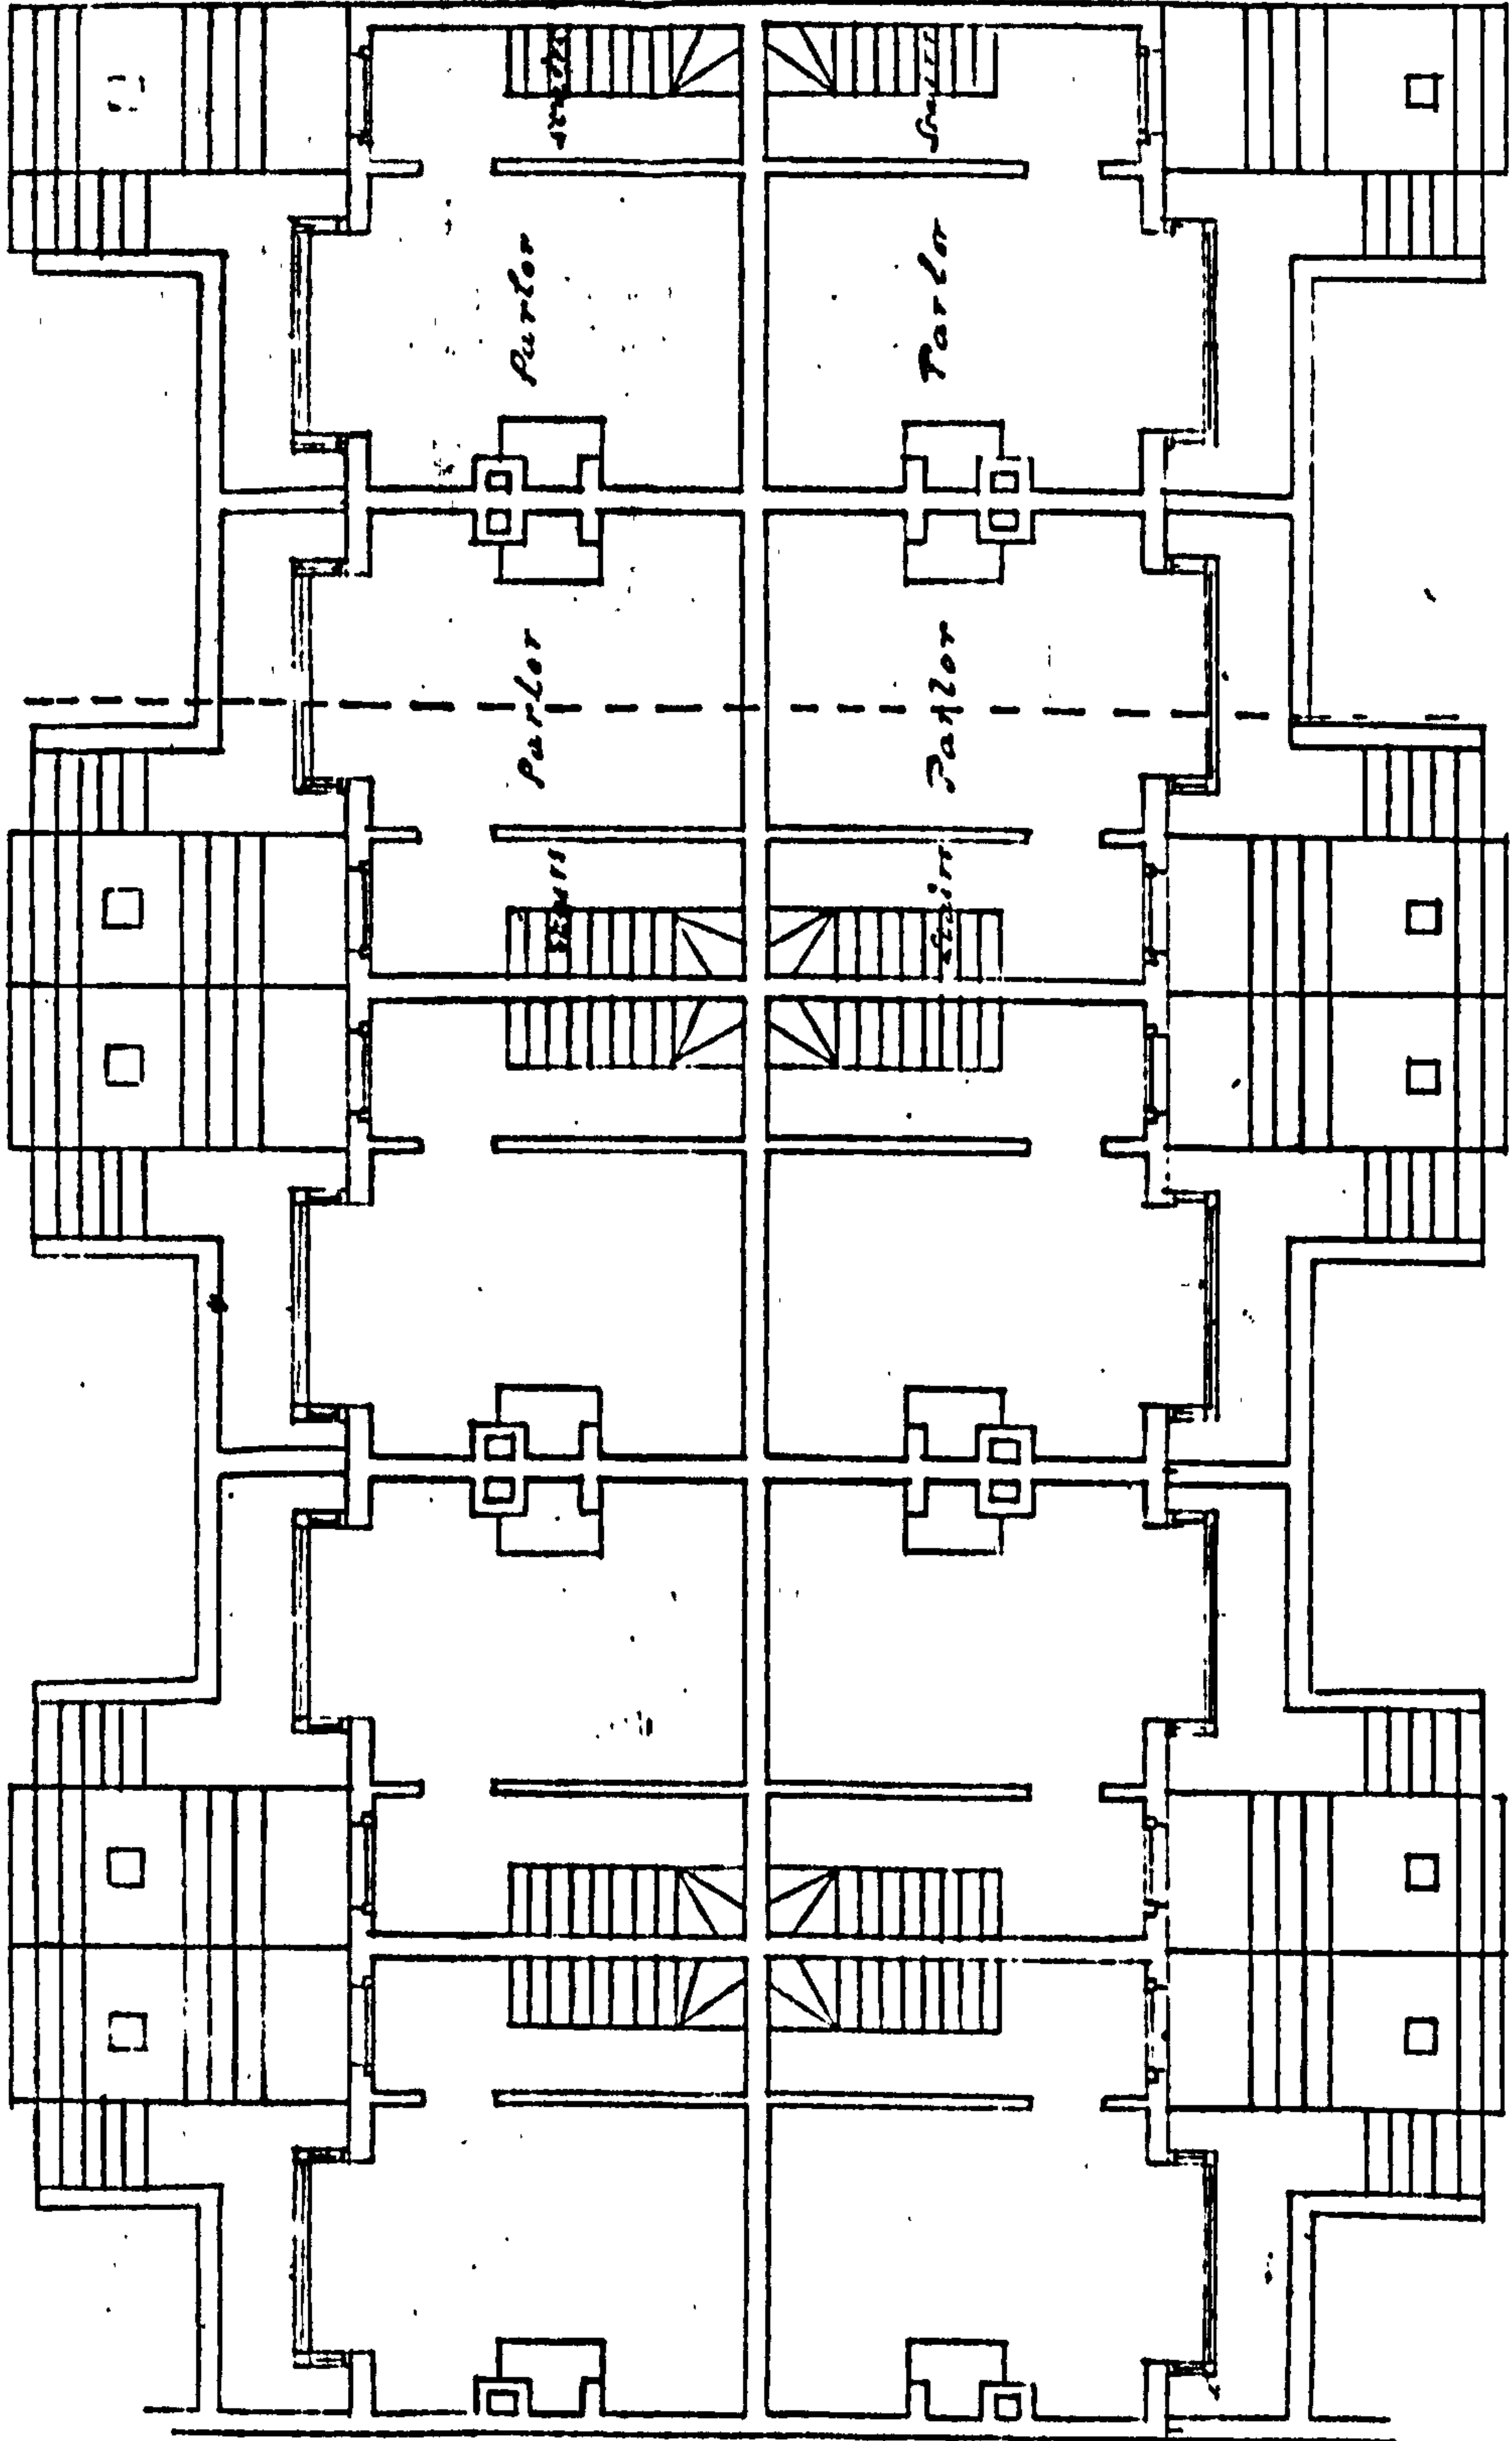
Deposited ground floor plan of four through houses, Manor Terrace (H. Preston 1910).
